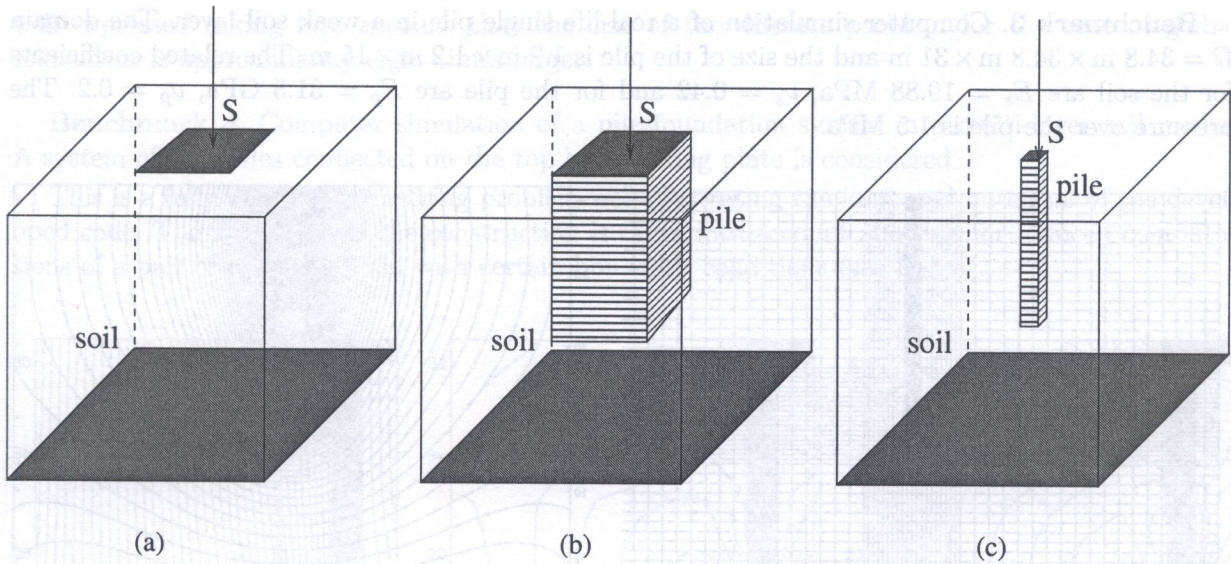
(a) Squire footing: BM1; (b) Foundation element: BM2($m = 3$); (c) Foundation element: BM2($m = 15$)
